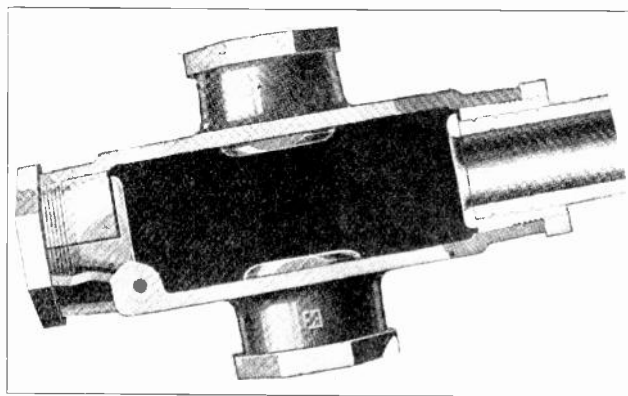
Sectional view of a fitting for threadless conduit, showing the special gripping sleeves inside its ends.
